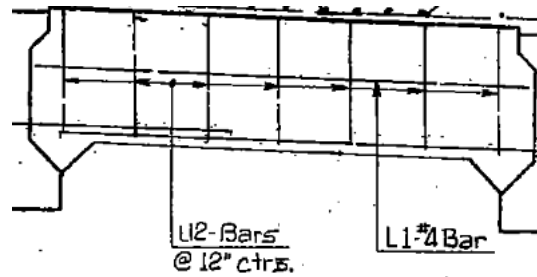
Diaphragm steel layout from original plans provided by ODOT
